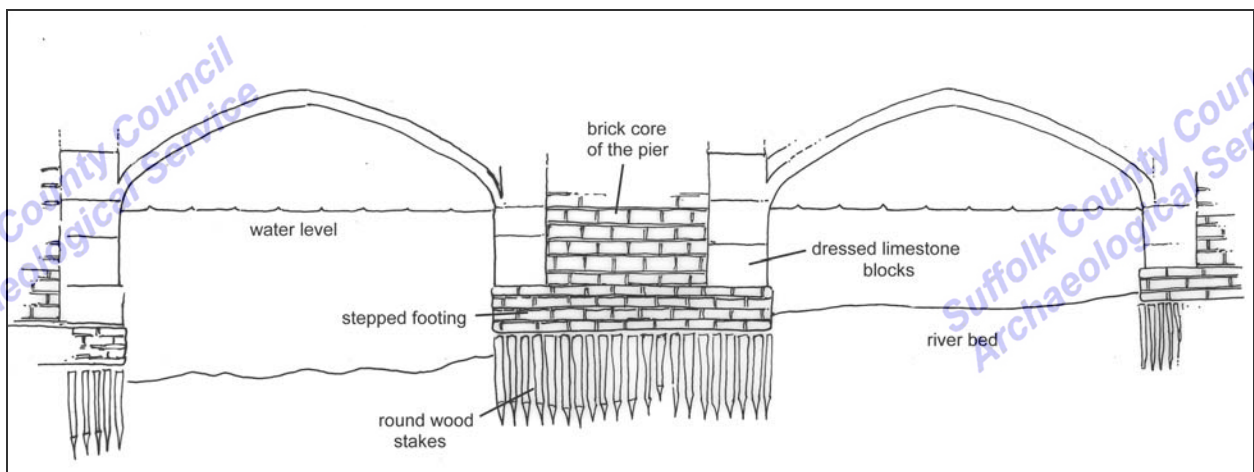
Illustrative section through the bridge pier showing wooden stakes footing
